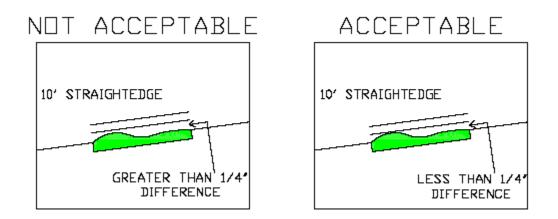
Example 8: Surface tolerances for street repairs should meet the standard for new construction.
